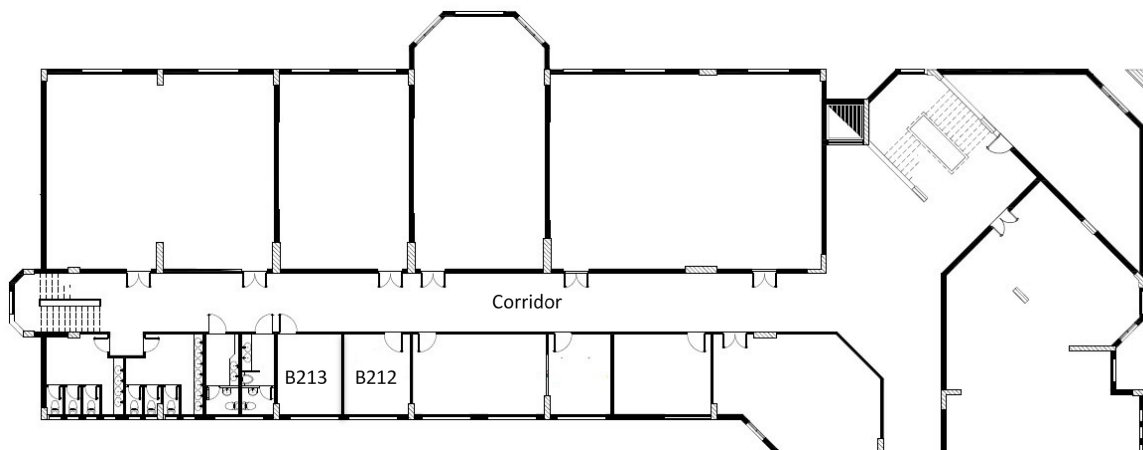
Typical floor plan for the School of Engineering, illustrating the proposed spaces to carry on the experiment, which are B212, B213, Corridor and Campus Courtyard
